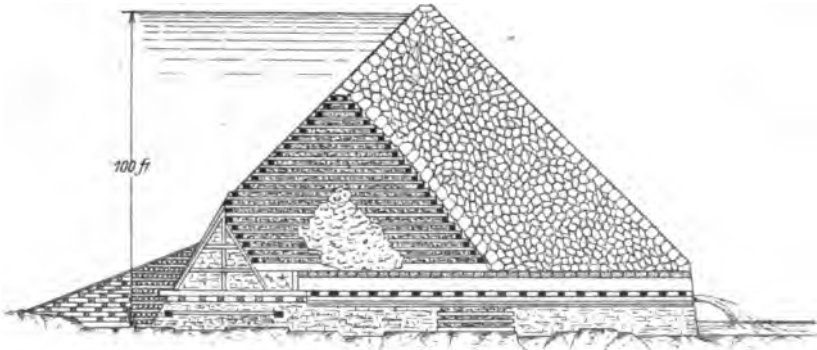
Cross Section of the Bowman Rock-Fill Dam.
